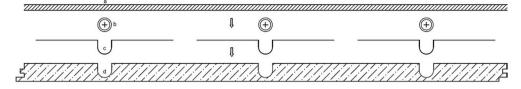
a) Floor covering b) Pipe, 17 × 2.0 mm c) Heat distribution plate, 0.3 mm, d) Under-floor plate, 22 mm.
